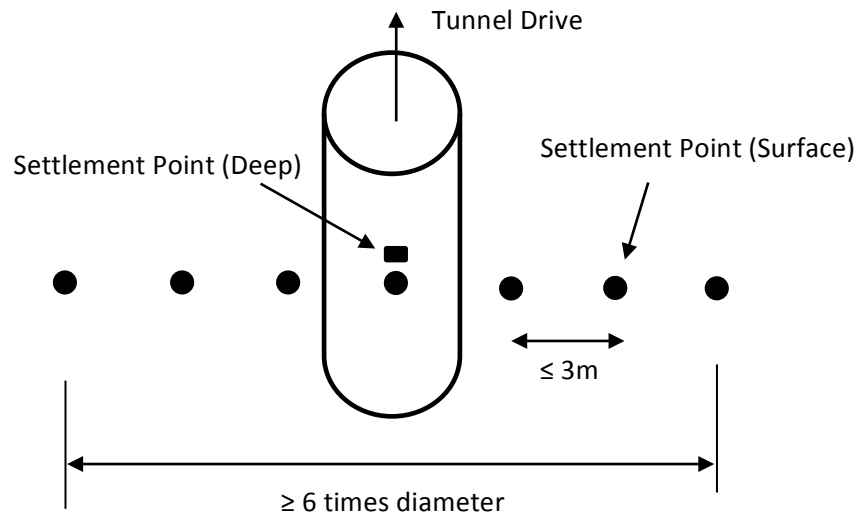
Typical configuration of surface settlement monitoring points across the tunnel alignment.
